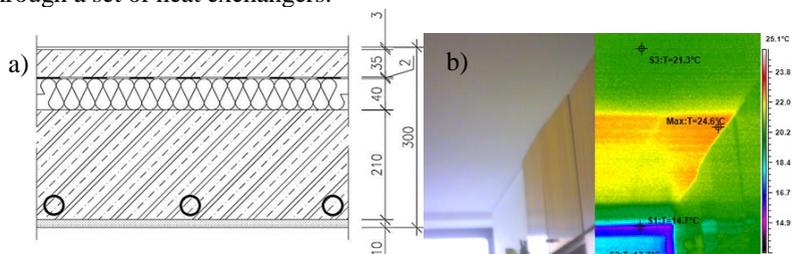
a) detail of the ceiling structure, b) infrared image of the thermally active ceiling.
